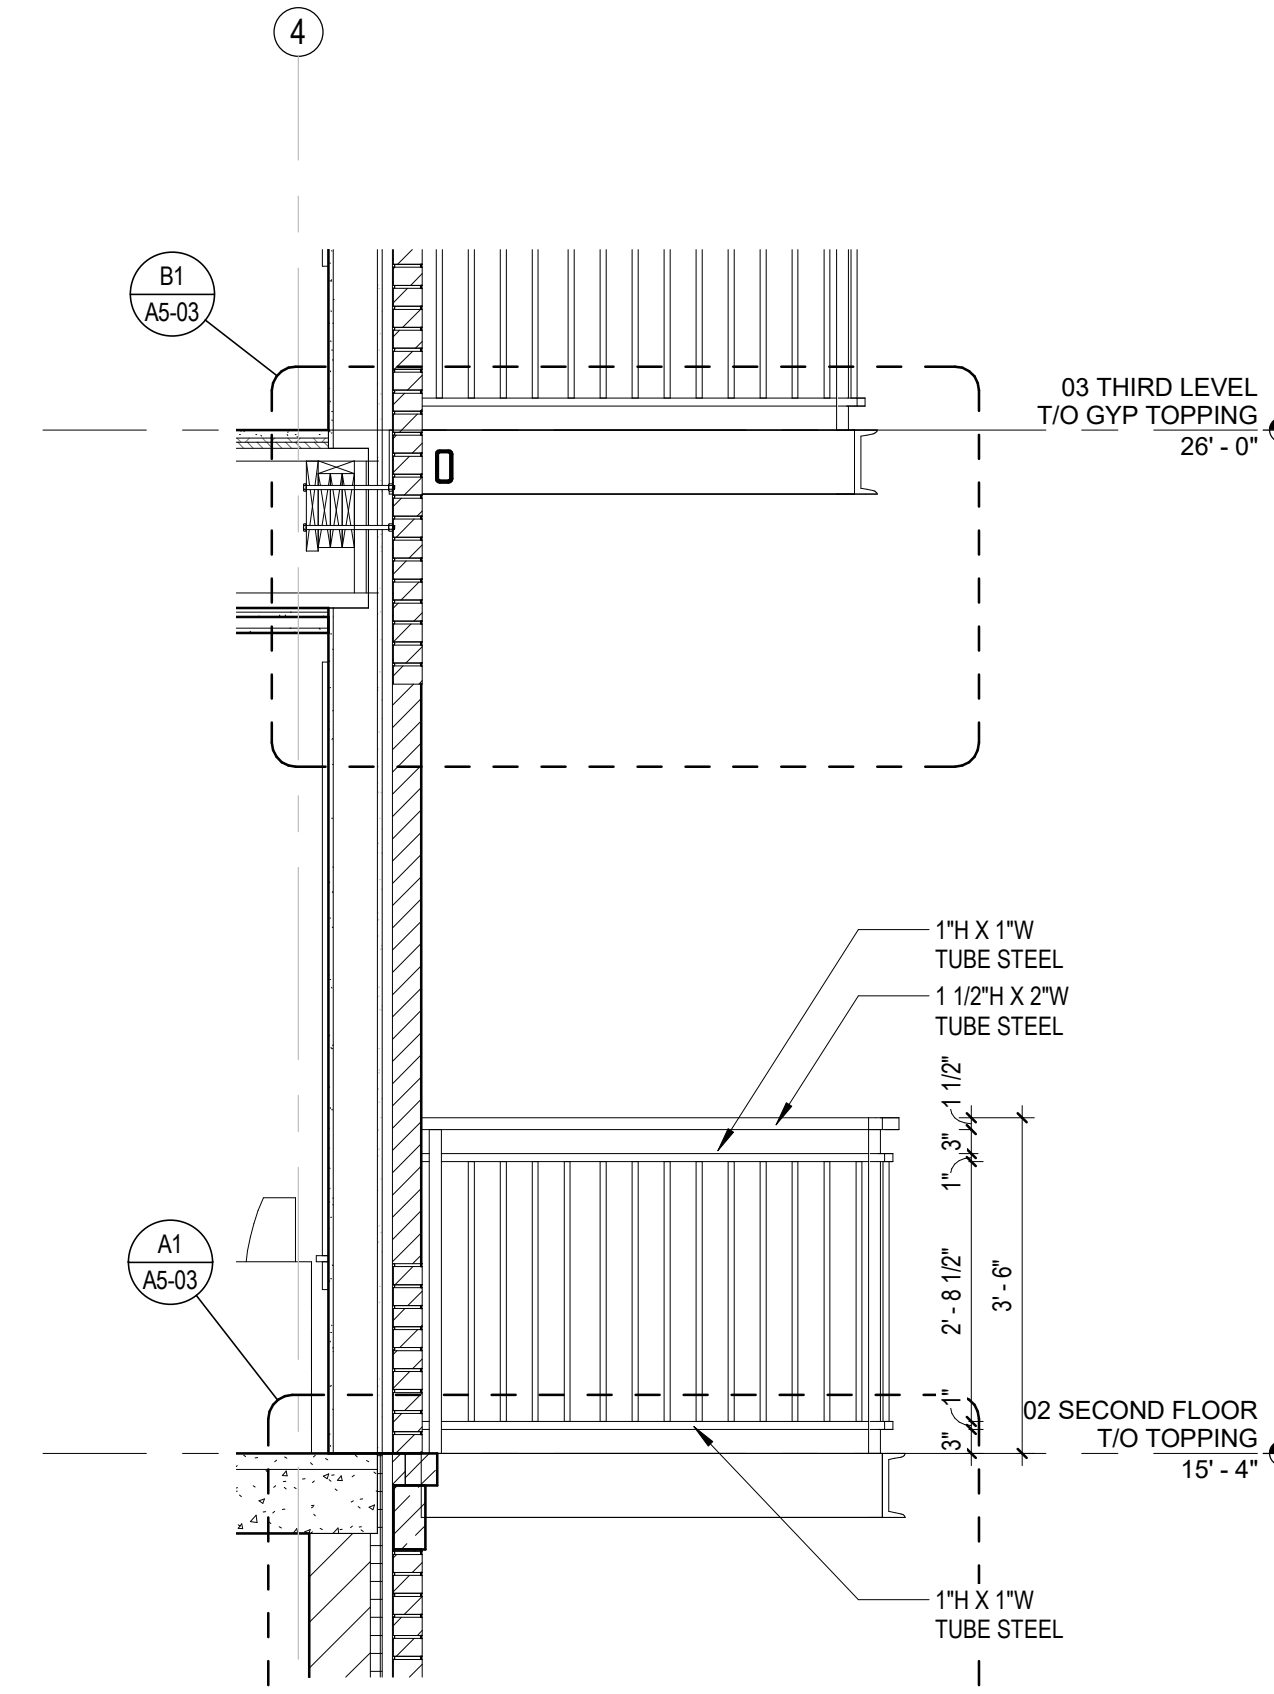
DETAIL- HANGING BALCONY CONNECTION AT WOOD FRAMING
